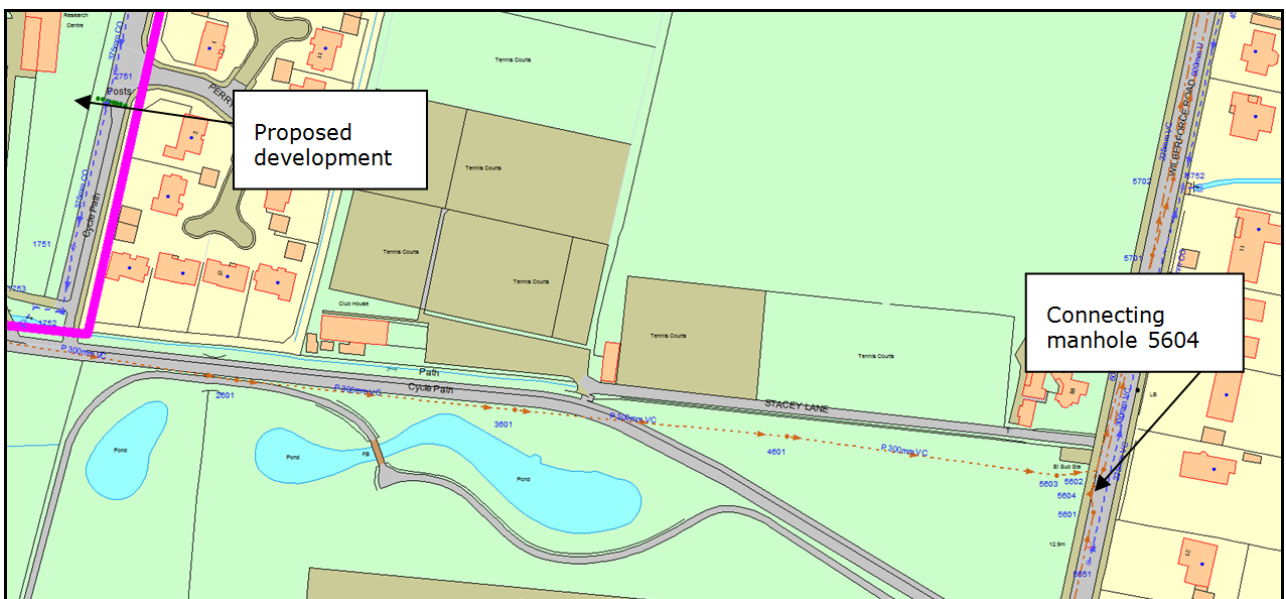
Showing the location of the proposed connection point in Wilberforce Road (40l/s)
